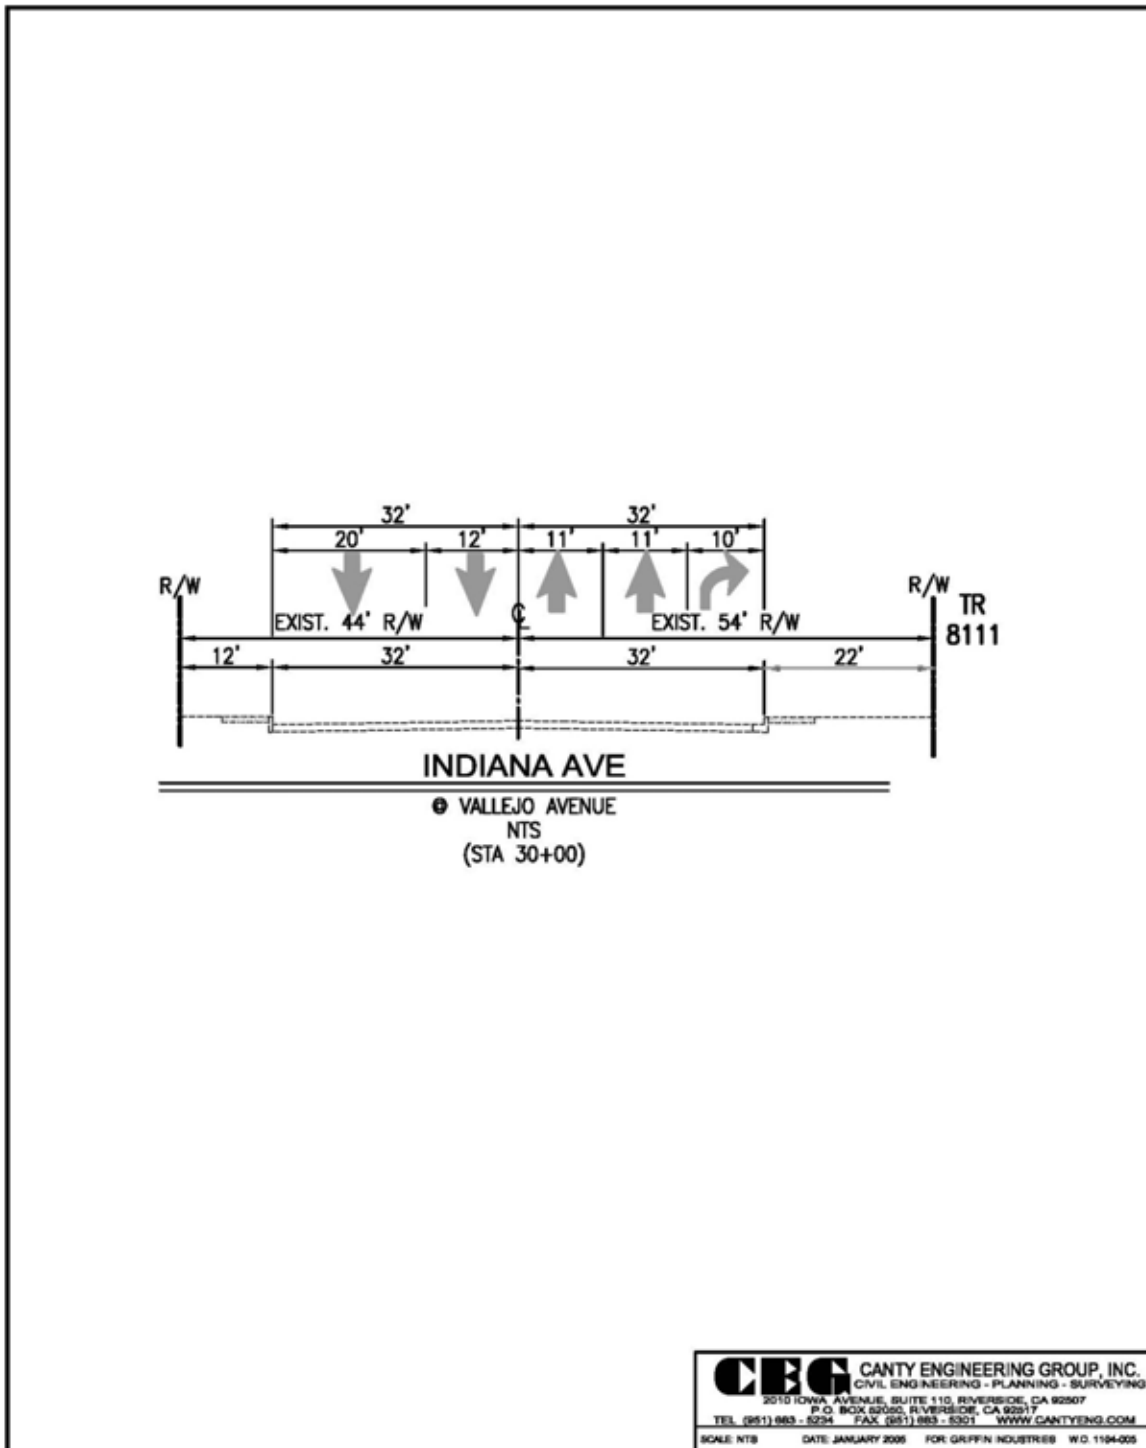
, "Indiana Avenue @ Vallejo Street Section"
